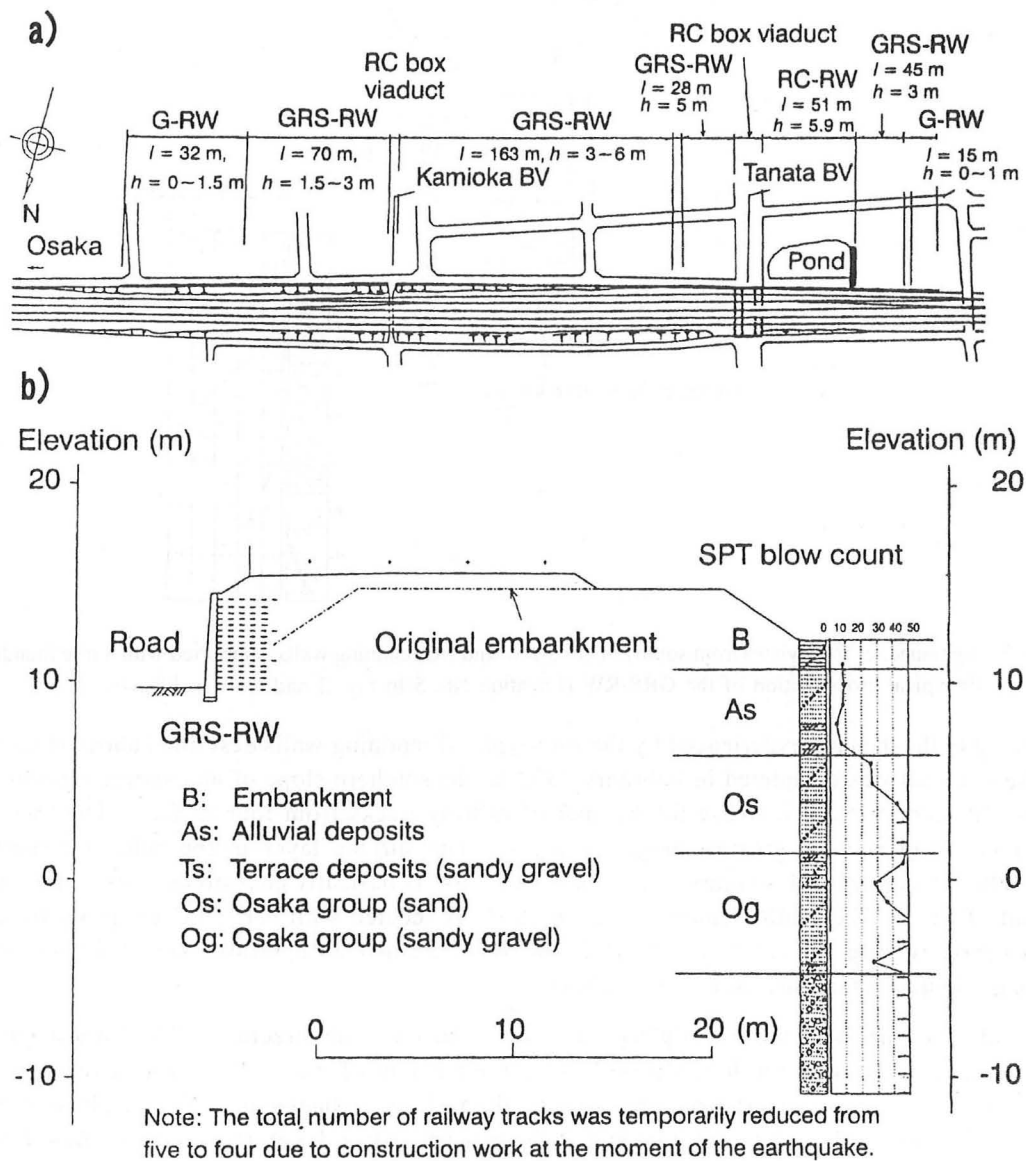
Tanata wall: a) plan view; b) cross-section of embankment
